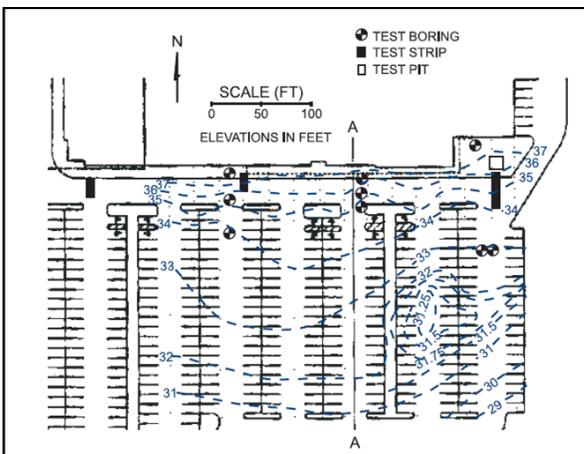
SURFACE TOPOGRAPHY OF PARKING LOT SOUTH OF THE BUILDING AND LOCATION OF TEST PITS/STRIP AND EXPLORATORY BORINGS
